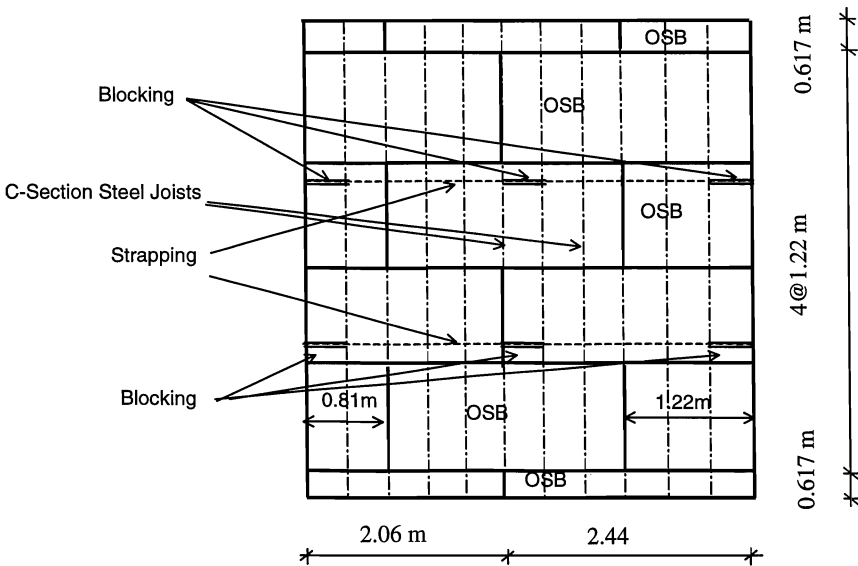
Floor layout (fl-6.114-2-6'-1/5-B0)
